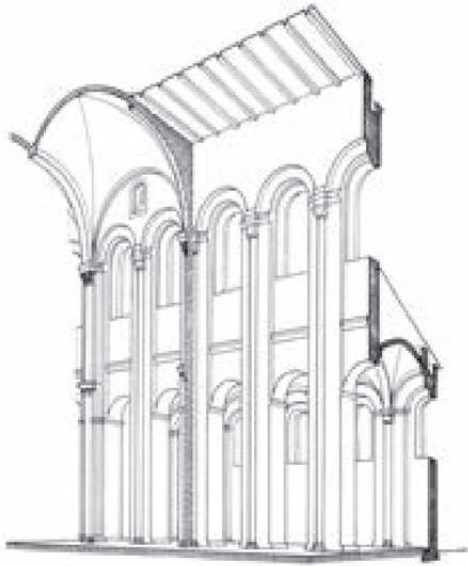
Speyer Cathedral, nave, c. 1070 and c. 1110 (reconstruction Hans Erich KUBACH & Walter HAAS)
